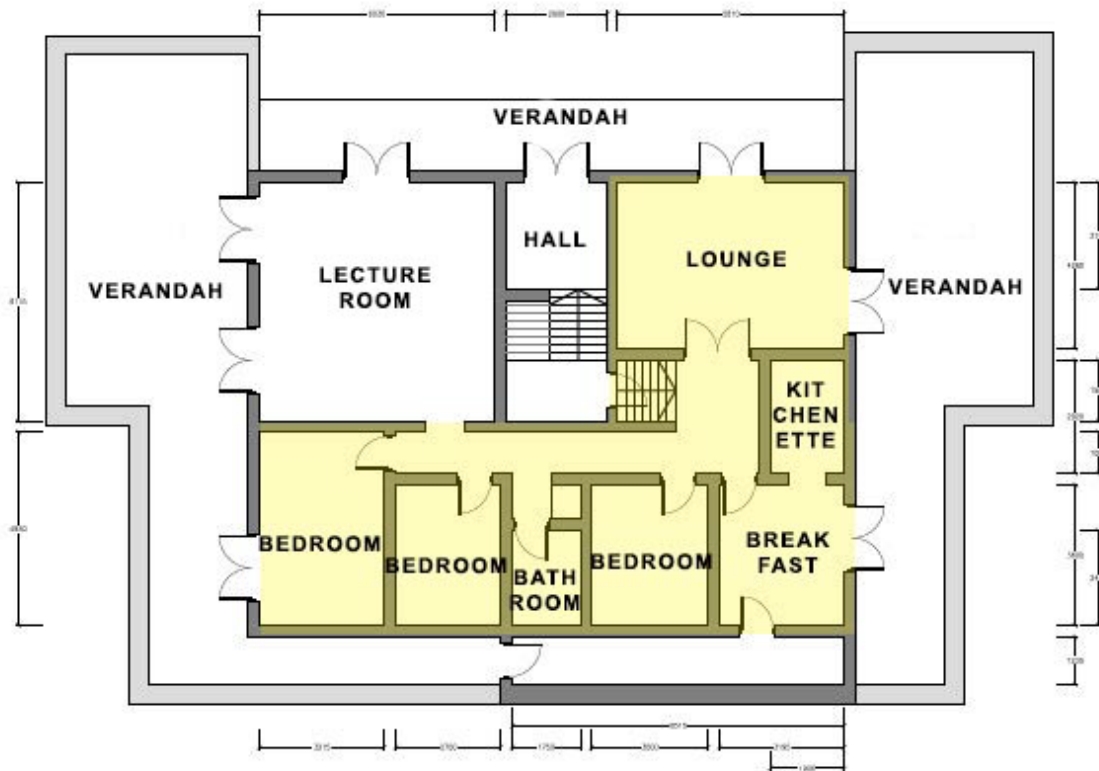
Conjectural original layout of the first floor layout. Source: Base plan by Bathurst Regional Council.
